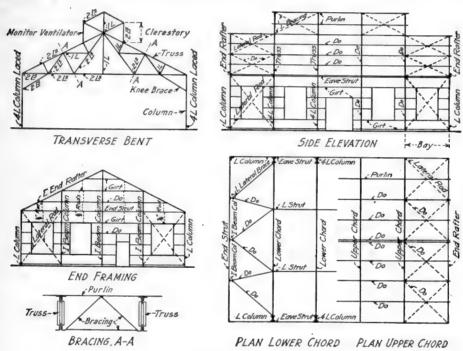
FRAMEWORK FOR A STEEL MILL BUILDING.
